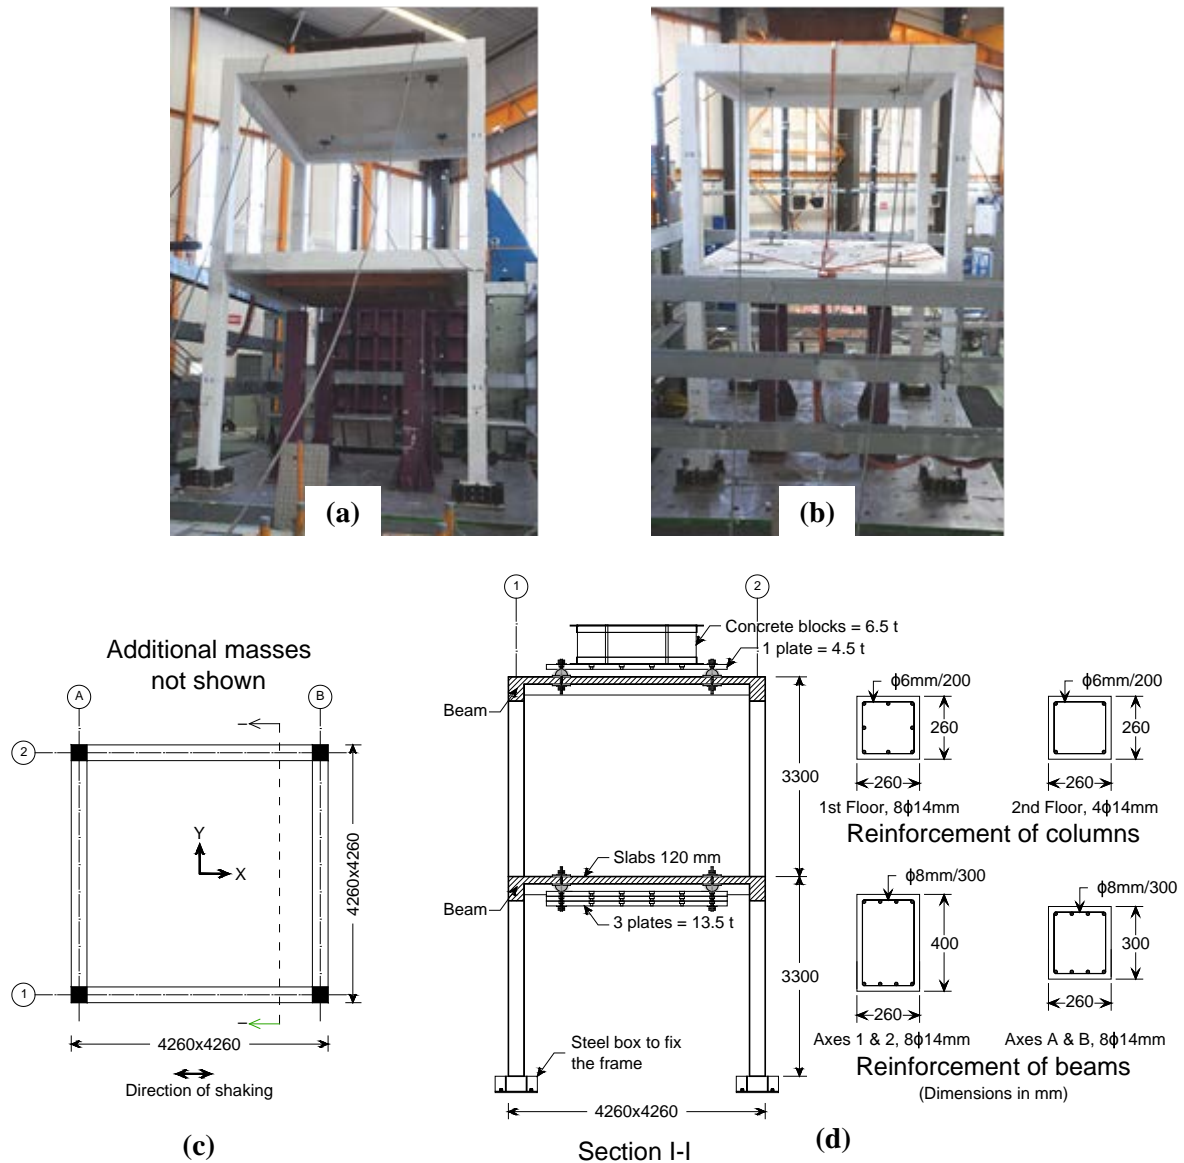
BANDIT building (a) general view axis A-A; (b) view axis 2-2; (c) plan view, and (d) geometry of building and members
